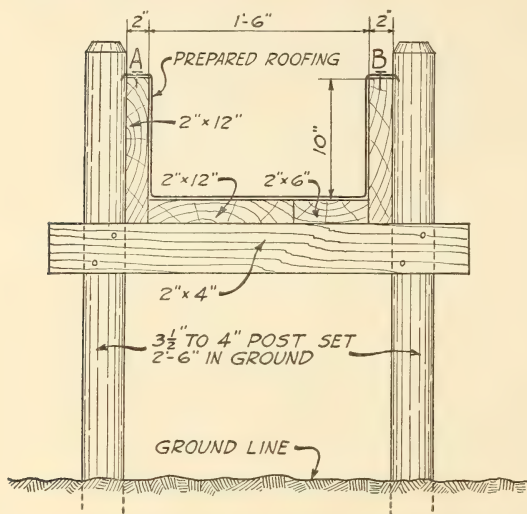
Detail of a flume design commonly used for farm ditches. The posts are spaced 8 feet apart along the length of the flume. The prepared roofing is laid lengthwise and whatever joints are necessary are made by sealing the edges with roofing cement. The edges at *a* and *b* are securely held with roofing nails.
